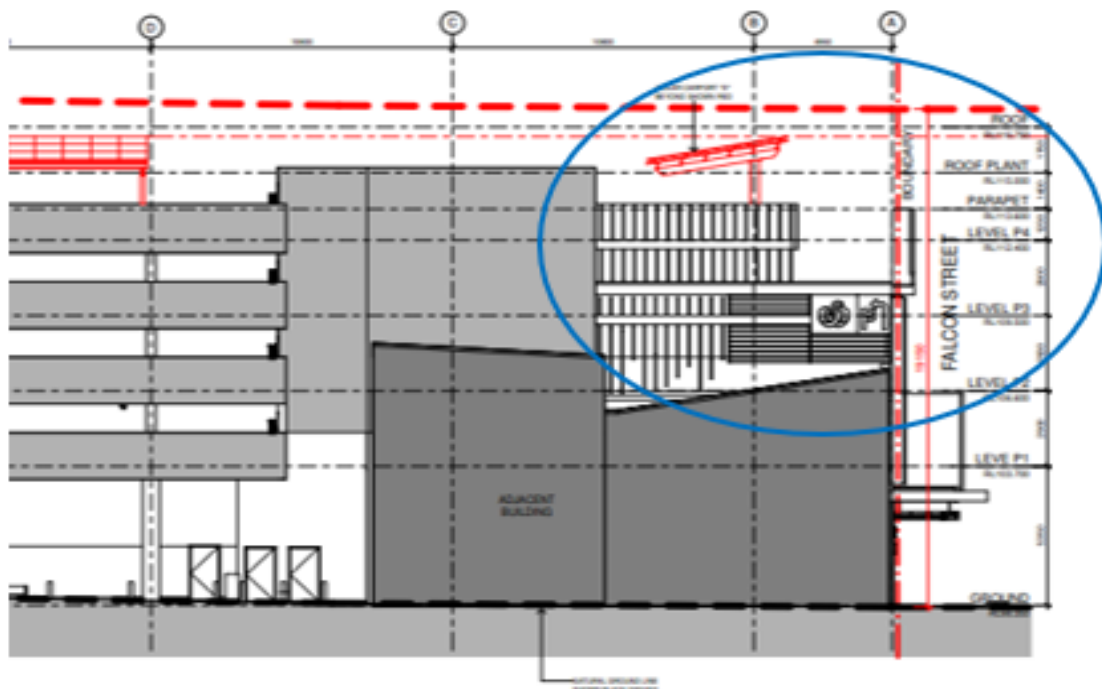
Extract of Section drawing detailing location of proposed Solar energy system and car port structure in proximity to the southern building parapet.
